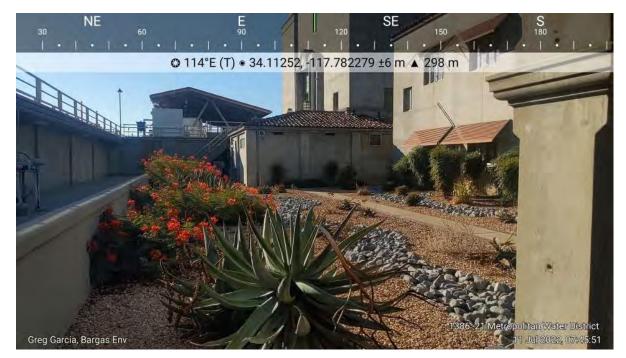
Representative photo of the Administration and Control Building (north-facing building) proposed to undergo various building improvements. Photo looking southeast from inside the Plant.
